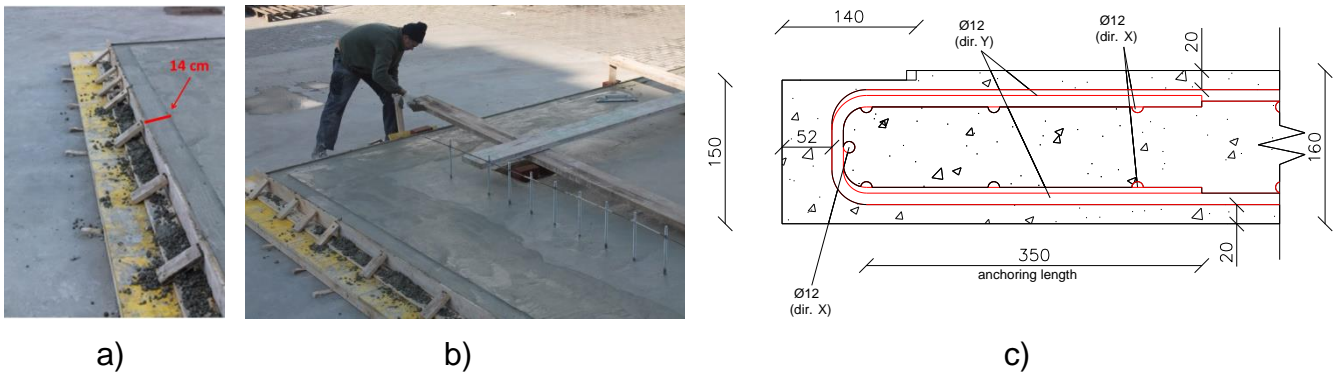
Reinforced concrete slab: a, b) concrete casting and finishing; c) edge detail. Units of mm.
